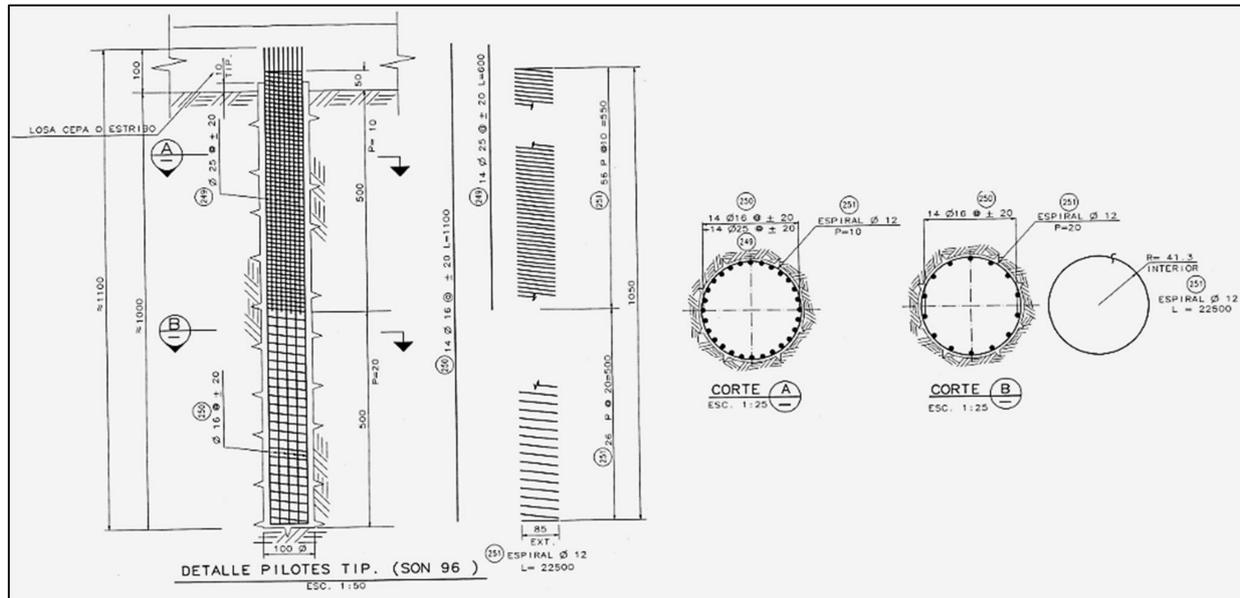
Original blueprint—the pile-type foundation of Río Blanco bridge.
